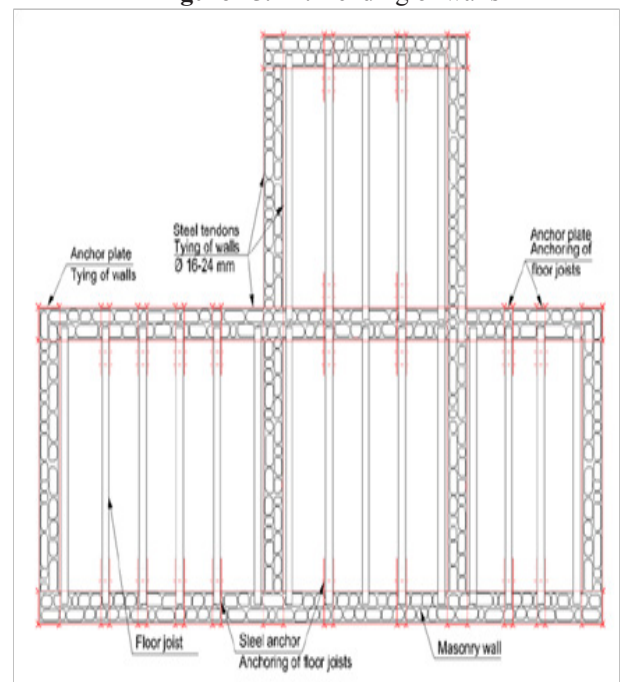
Distribution of horizontal ties in the plan and anchoring outside the plan of floors with stone masonry
